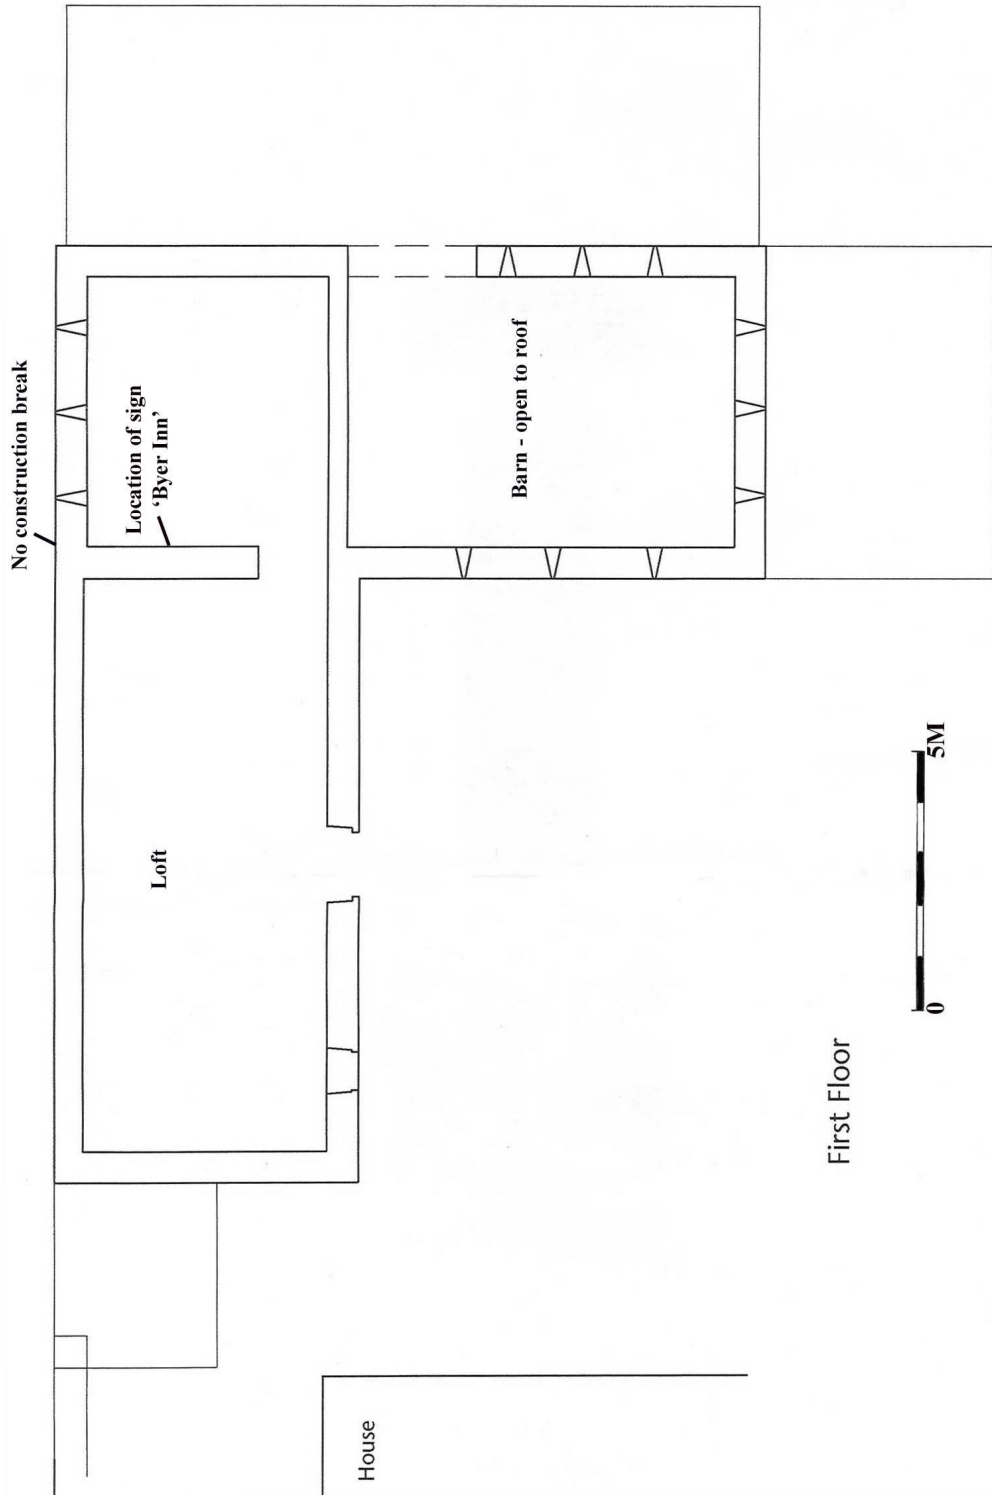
First floor plan of farm buildings (Gary Kirkby Design)
